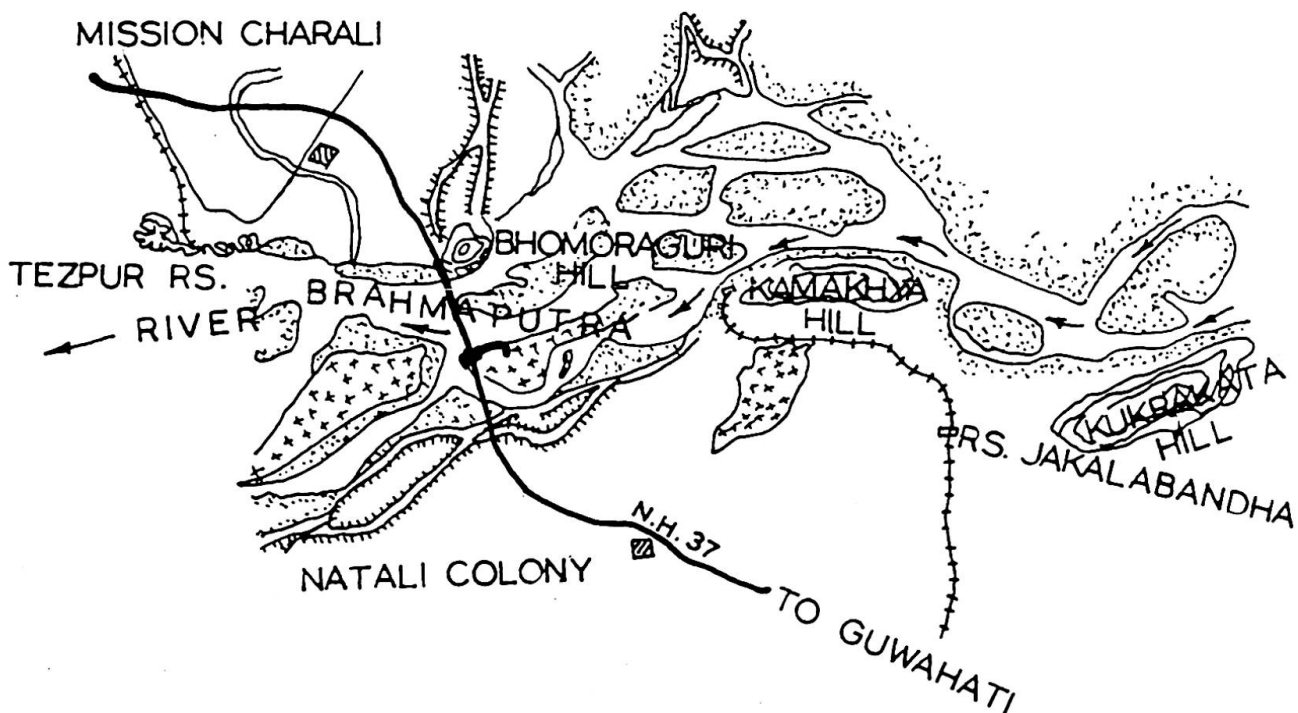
LOCATION PLAN OF TEZPUR BRIDGE
